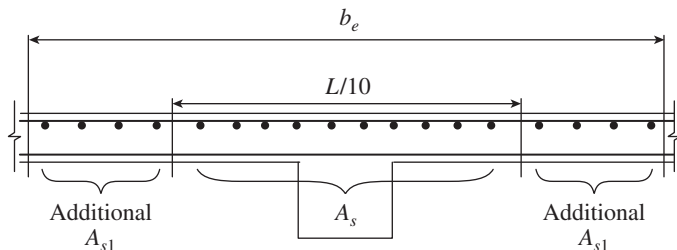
Negative moment reinforcement for flanged floor beam
